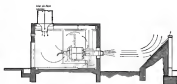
Type 1-40 engine in test cell without exhaust silencer.
